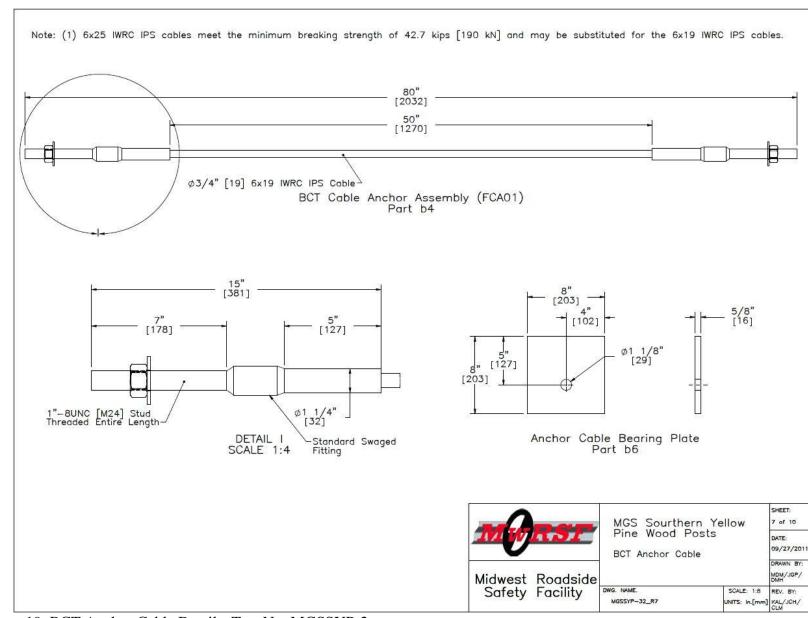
BCT Anchor Cable Details, Test No. MGSSYP-2
